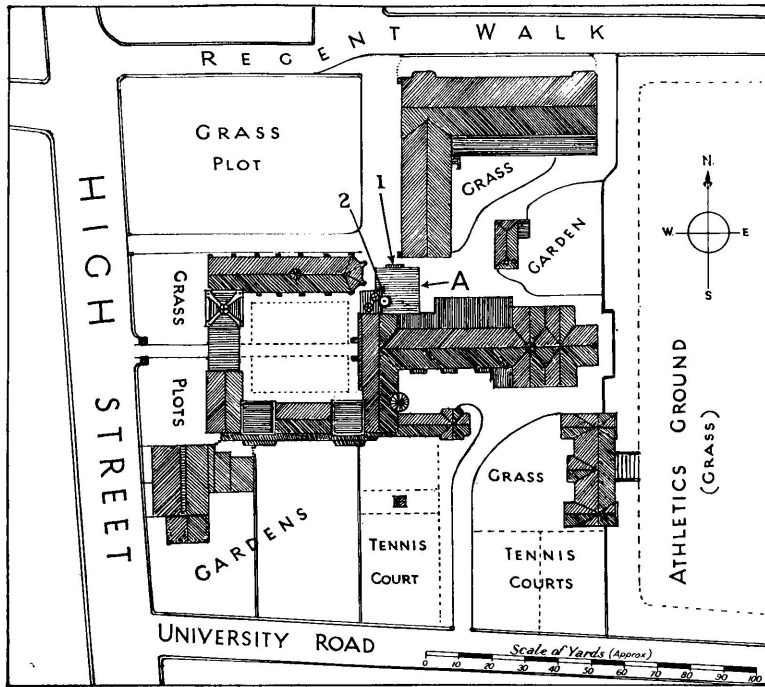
PLAN SHOWING SURROUNDINGS OF OBSERVATORY TOWER, KING'S COLLEGE.
